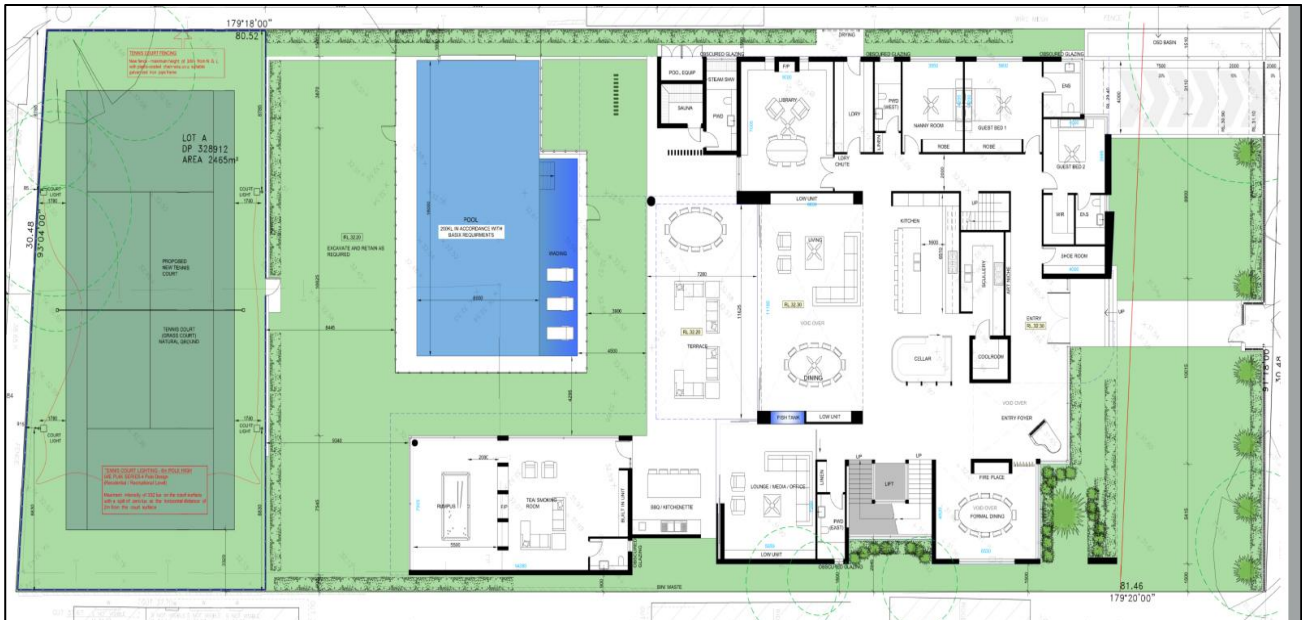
Extract of the applicant's submitted Ground Floor Plan.
